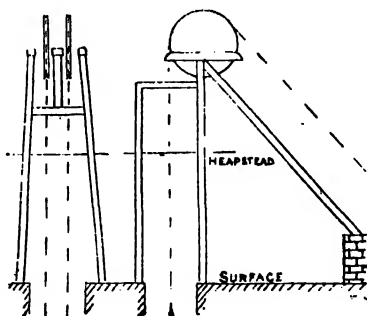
Side and End View of Pulley Frames and Pulleys
